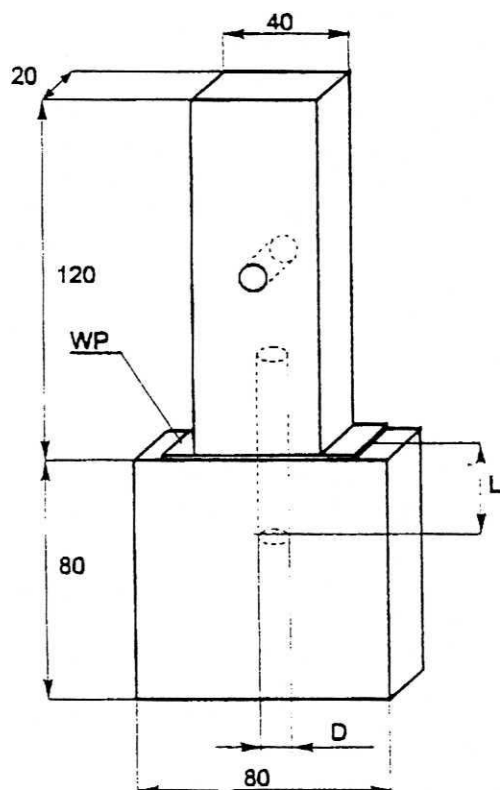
Dowel test specimen:  $D$  – dowel diameter,
